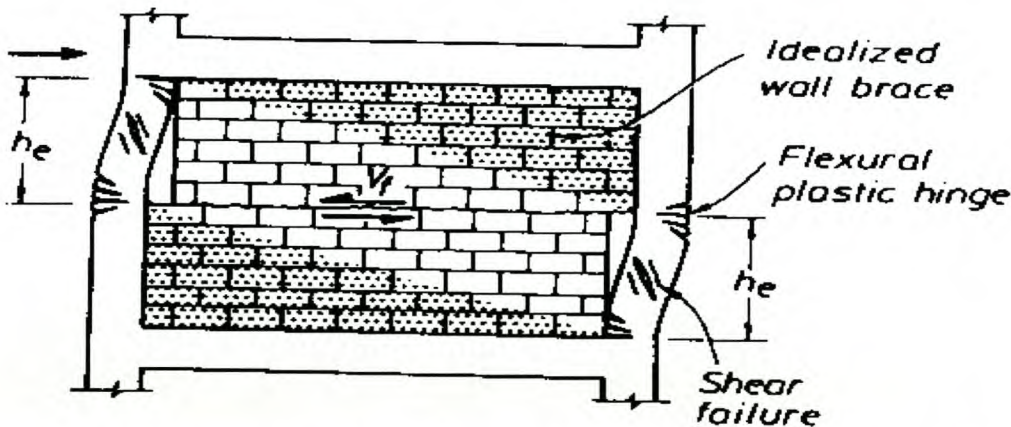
Sliding shear failure of masonry infill (Priestley and Paulay, 1992)
